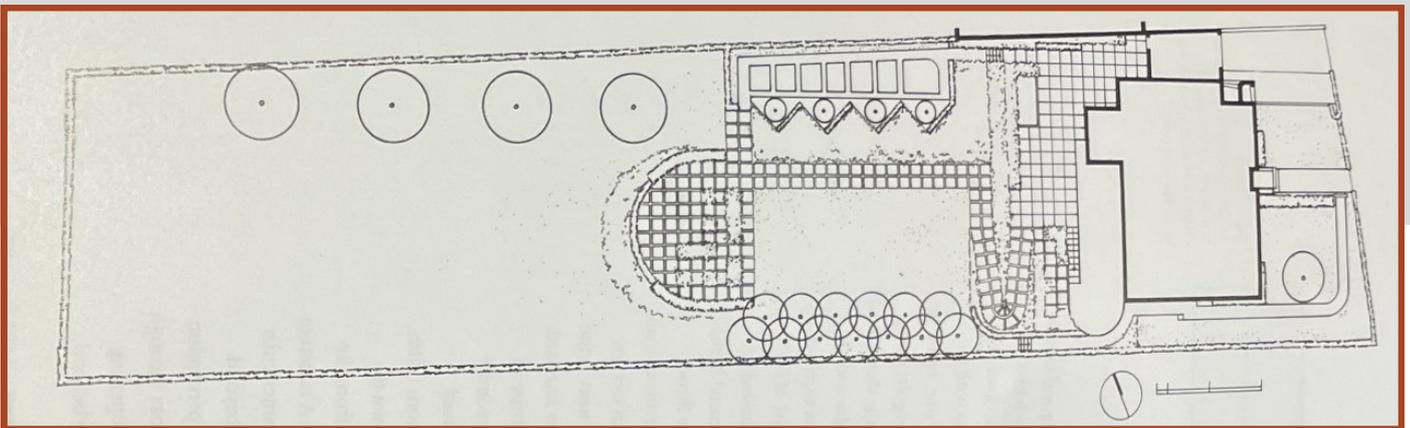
Plan of the Heeremans Garden (Imbert, 2009, p. 86)
